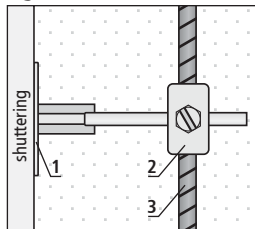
Double thread of a fixed earthing terminal - bolted / compressed terminal axis
